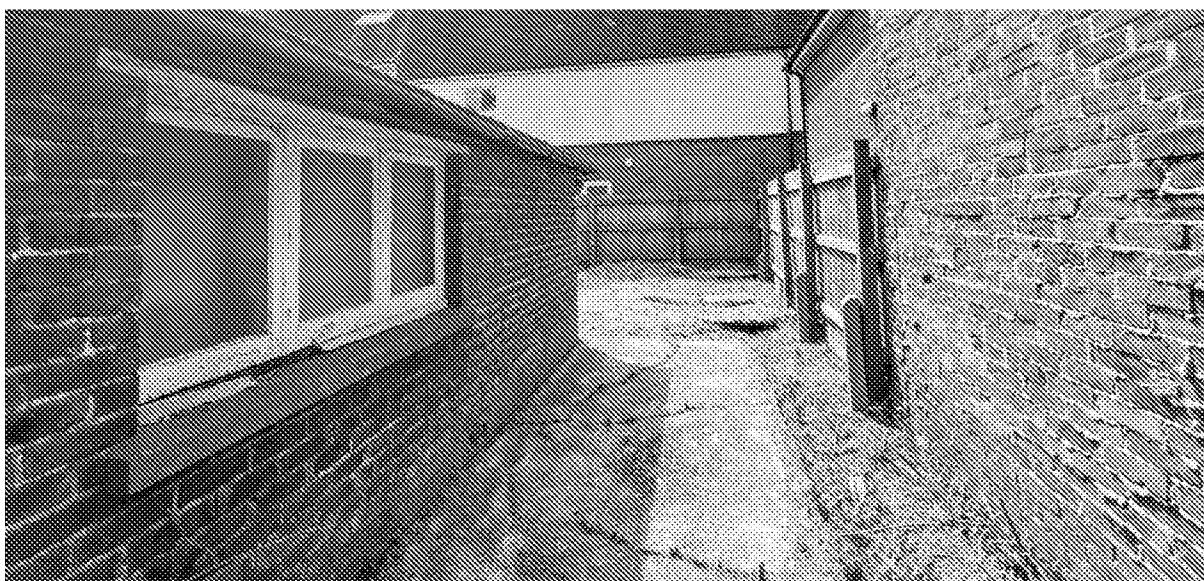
View of Yard to South taken from Outside Double Doors in Rear Elevation
